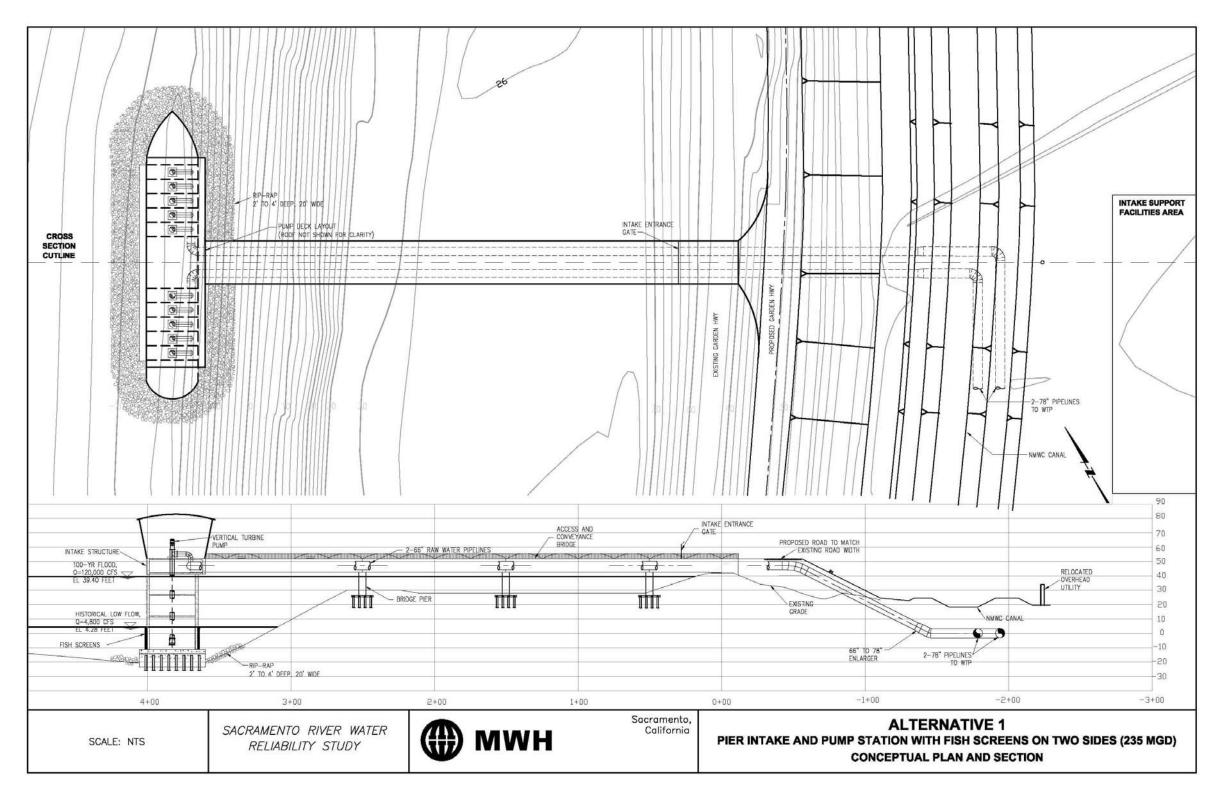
Alternative 1 - Pier Intake Structure and Pump Station with Vertical Fish Screens on Two Sides
